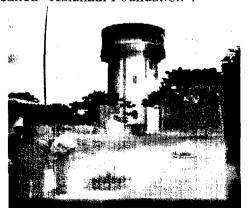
Water tower and treatment plant site of Salyawewa water supply system
